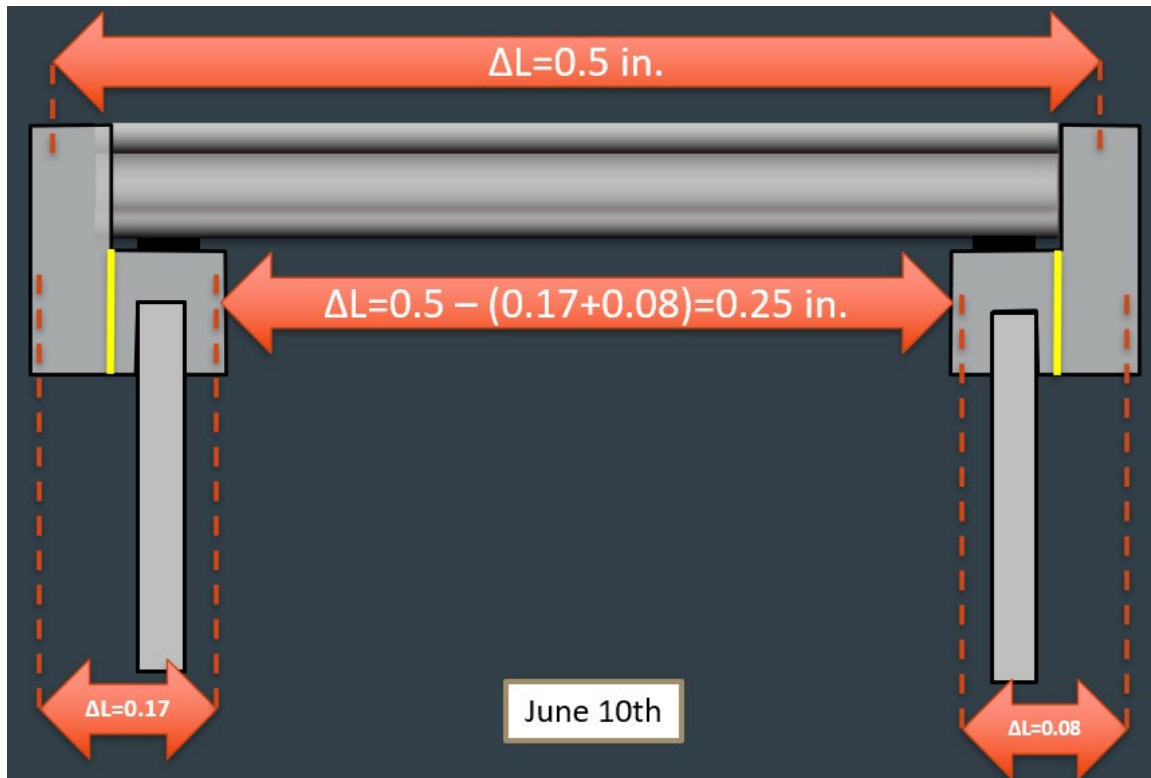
Illustration showing lateral deformation at abutment caps due to interaction between deck and abutment caps
